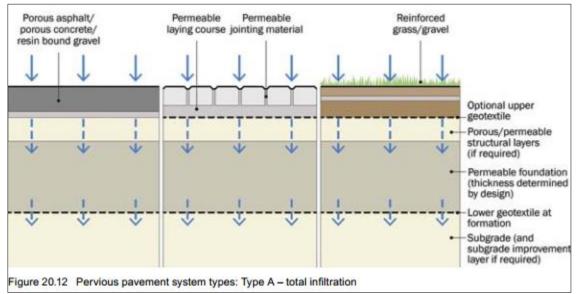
Typical Cross Section of infiltration permeable paving (Extract from CIRA SuDs Manual)
